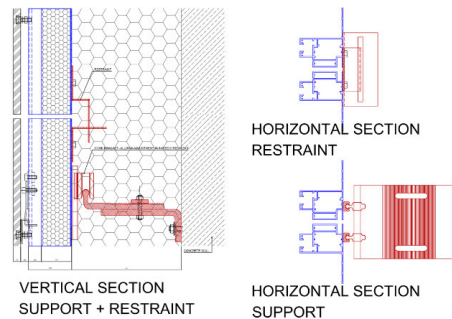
Macro-panel frame anchoring system to the concrete slab, as for curtain wall
